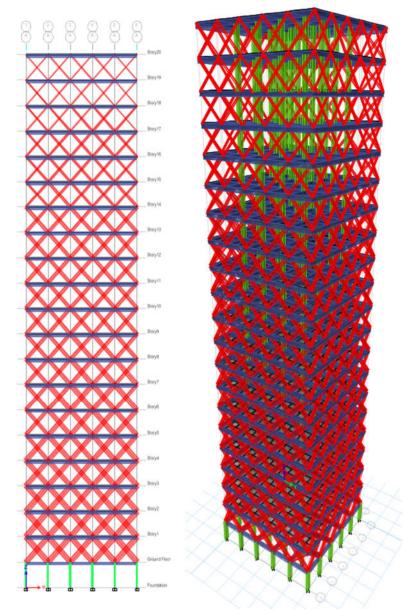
45-degree diagrid structure elevation and 3D extruded view
